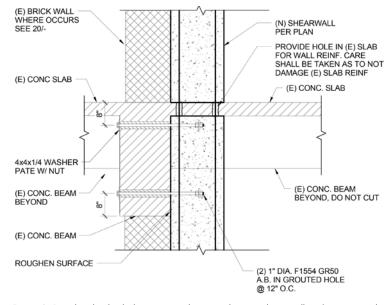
Detail at the thru-bolt connection between the new shear wall and existing girder. Also showing vertical wall bars passing through cores in the slab.
